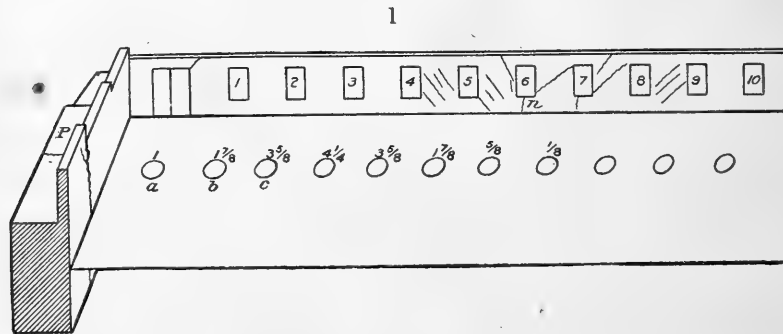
Diagram showing N.W. end wall and N.E. side wall of mill, with floor in position; other walls and roof omitted. P, cement pier, a, b, c, etc., pulp-grinders, 1, 2, 3, etc., windows. Total length of building, 248 feet.
